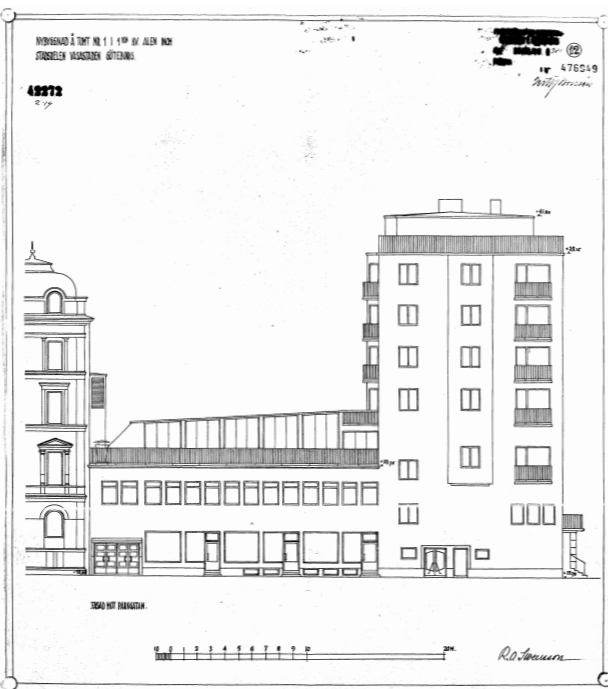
North elevation. Original drawing (1940) (Göteborgs Stad., n.d.)
